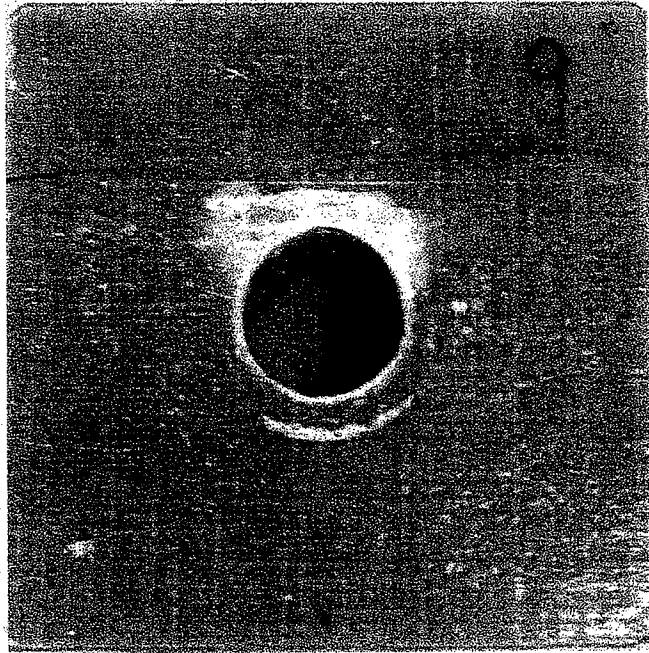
Typical Damage to Bottom Face Sheet in Specimens Using Type 2 Connection
